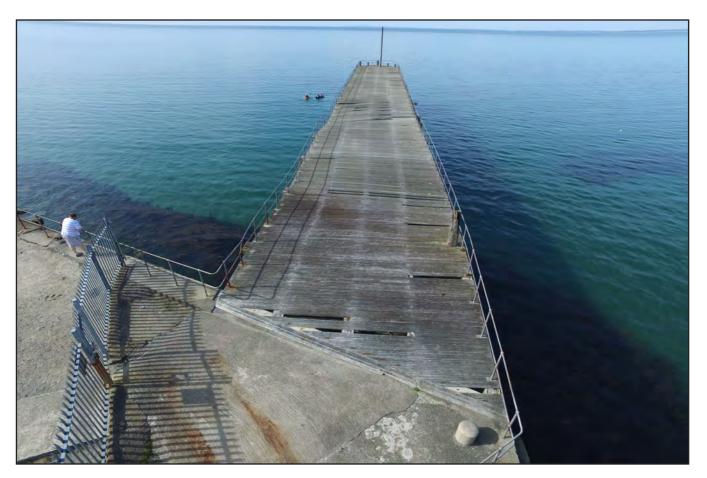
View of the pier from the south-southeast showing the timber decking (UAV image: DJI_0725)
